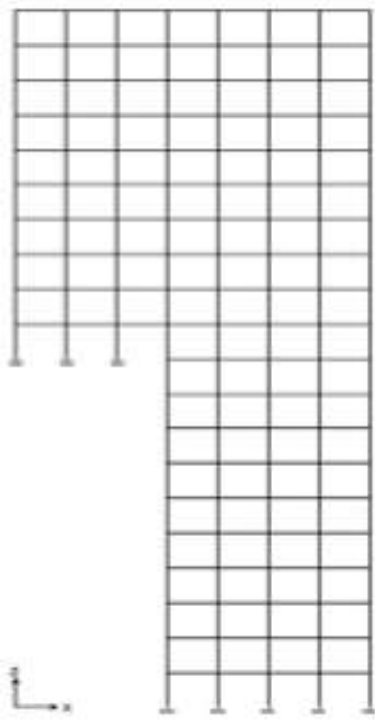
Model 4-Building on Vertical Cut/Steep Slope
